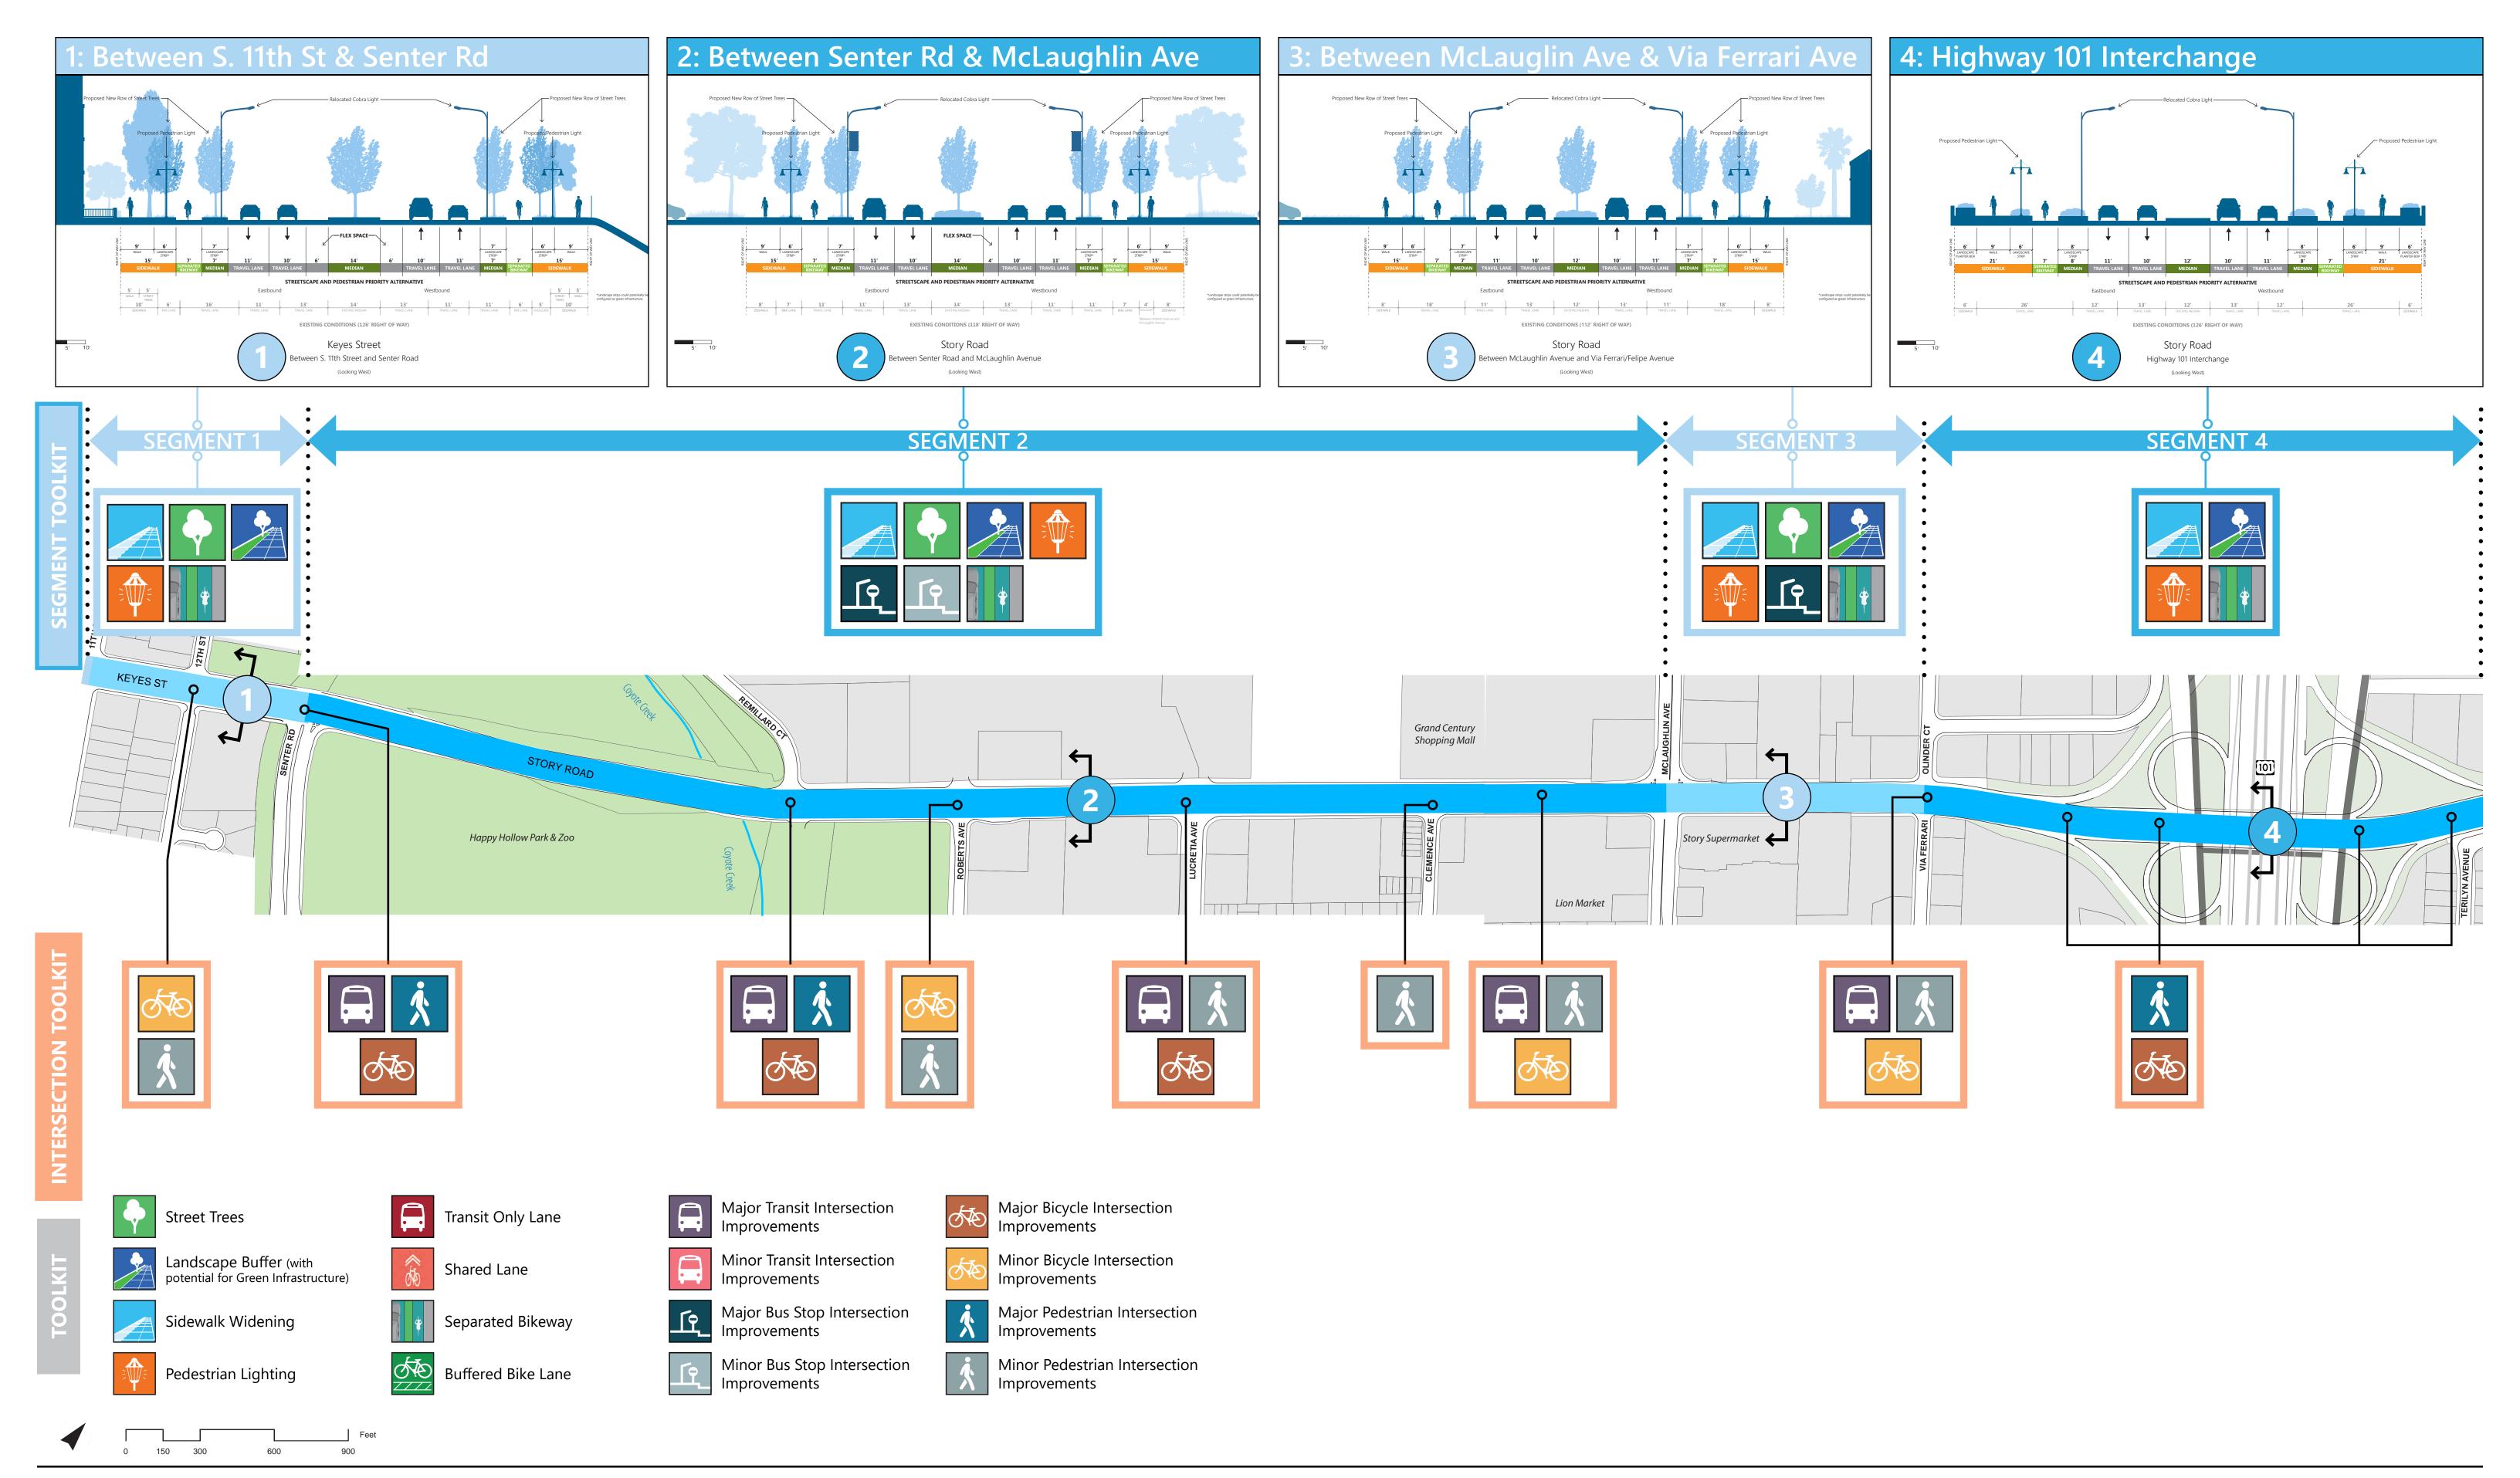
B: Keyes Street at S 11th Street to Story Road at Knox Avenue STREETSCAPE AND PEDESTRIAN PRIORITY ALTERNATIVE
